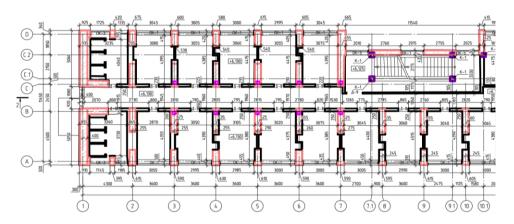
The part of the 3rd floor's plan in axes 1-10.1/A-D
